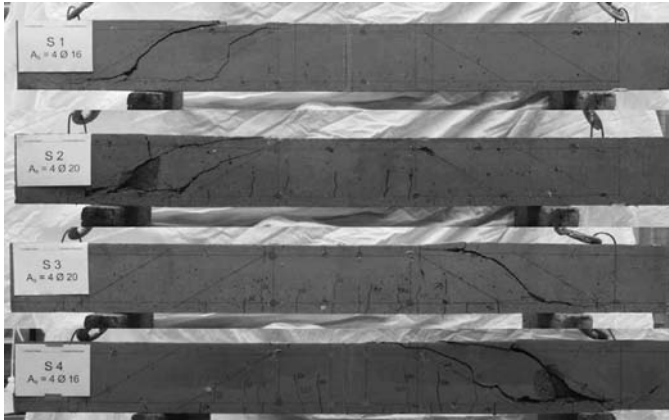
Photographs of failures of first series of test beams without shear reinforcement and without fibre reinforcement [109]
